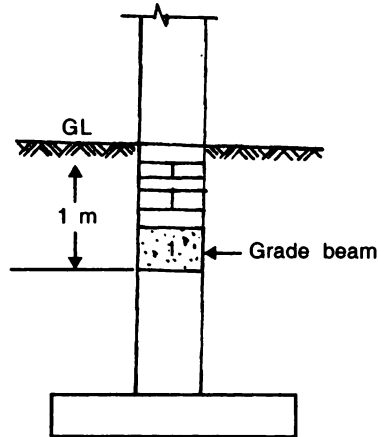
Location of grade beams: 1. In framed buildings.
